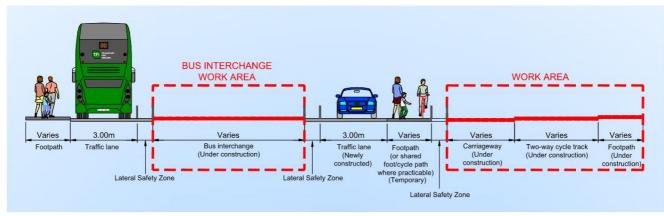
Traffic Management Cross Section, Section 1g – Stage 3
